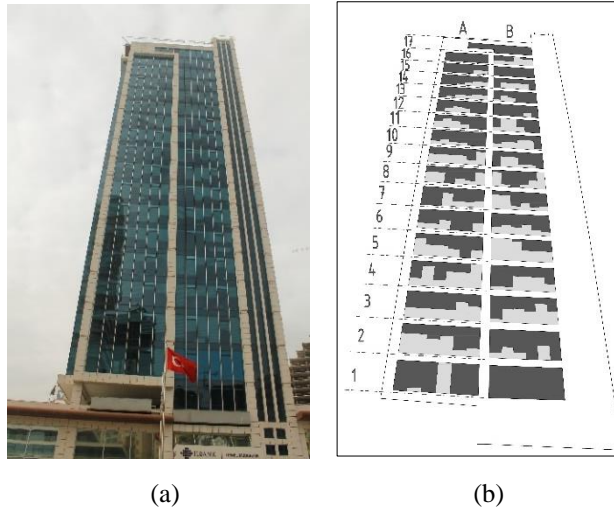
Perspective (a) Southeast facade (b) Southeast facade drawing
